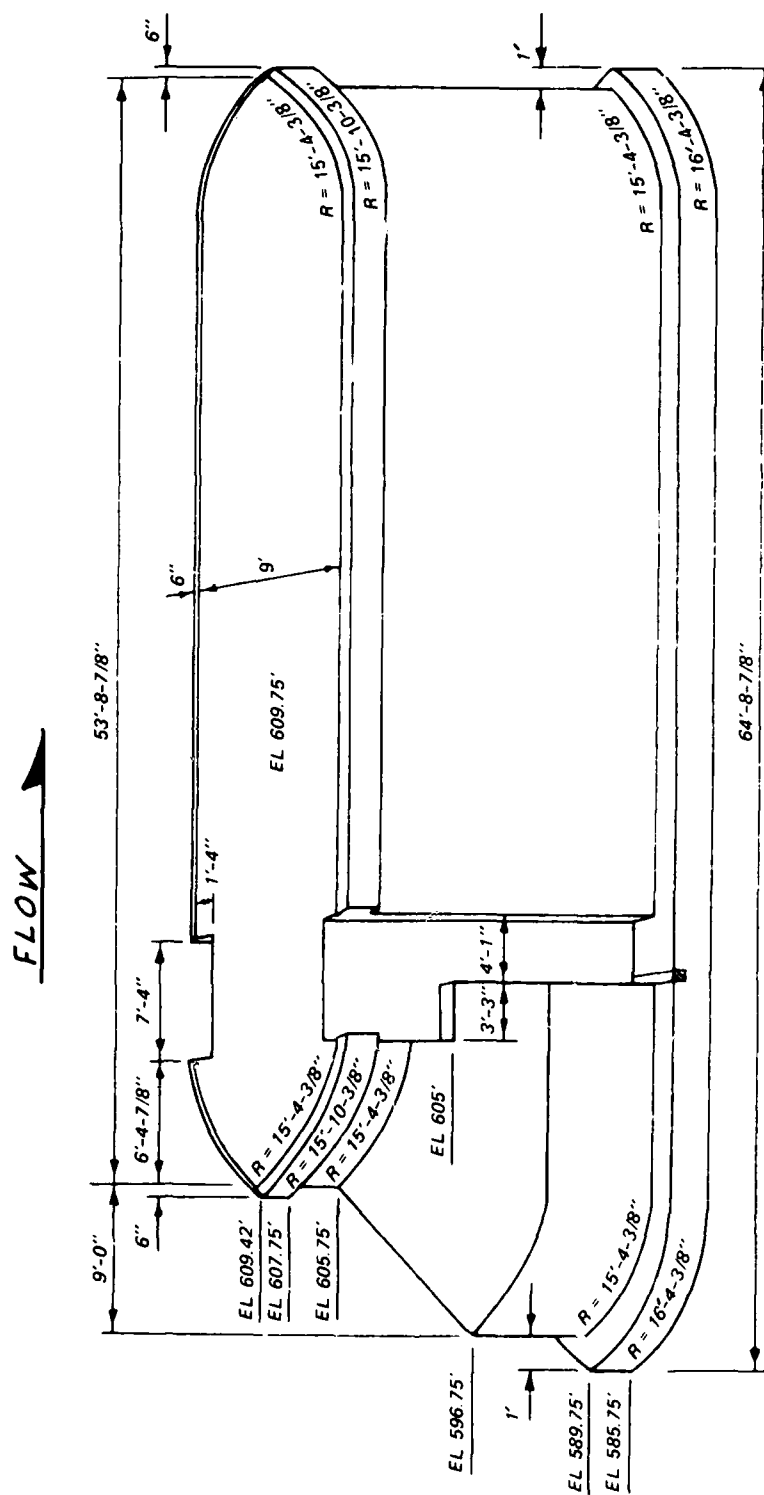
Typical geometry for dam piers 9 and 13, Soo Dam
